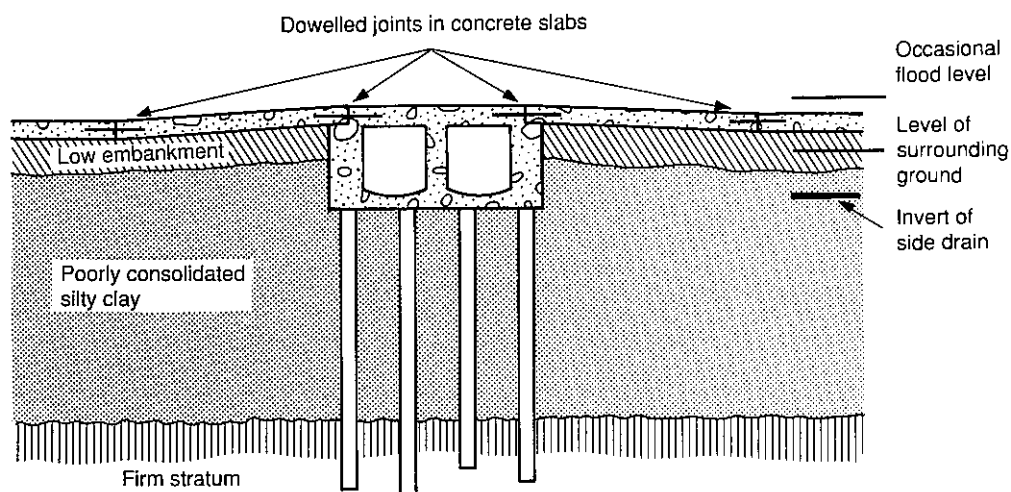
Settlement of concrete road over compressible soil adjacent to culverts.
